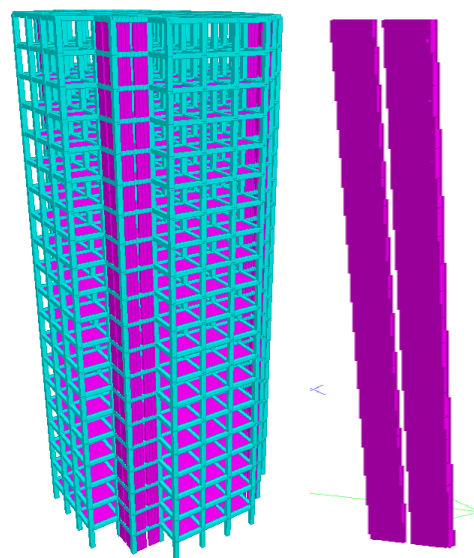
Case WO2: - (Bay size = 5 m x 4 m & shear wall opening area = 0.55 m x 4 m (11%))
